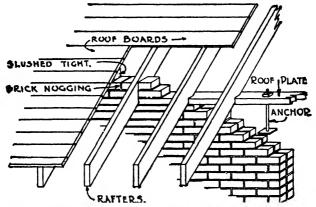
,353.—Method of anchoring roof plate showing rafters and roof boards in place.
